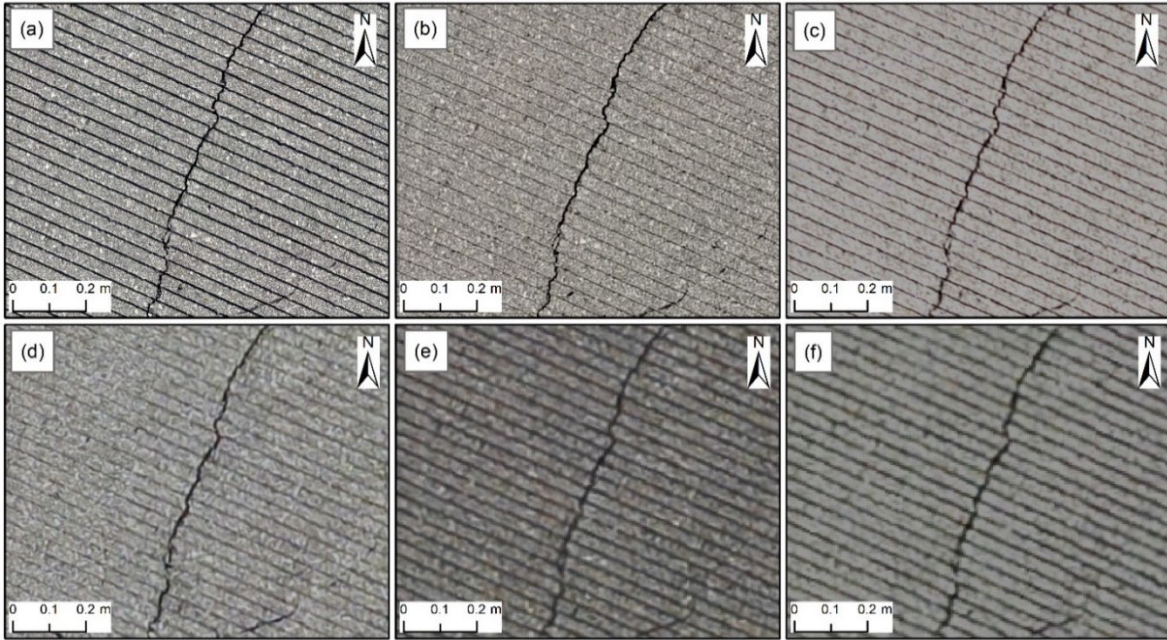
Unsealed L&T cracks (L) and Weathering (L) on Asphalt Overlay Over Asphalt Concrete Pavement at TTF: (a) 0.8-mm/pix Orthophoto, (b) 1.5-mm/pix Orthophoto, (c) 2.3-mm/pix Orthophoto, (d) 2.4-mm/pix Orthophoto, (e) 4.9-mm/pix Orthophoto, and (f) 5.8-mm/pix Orthophoto
